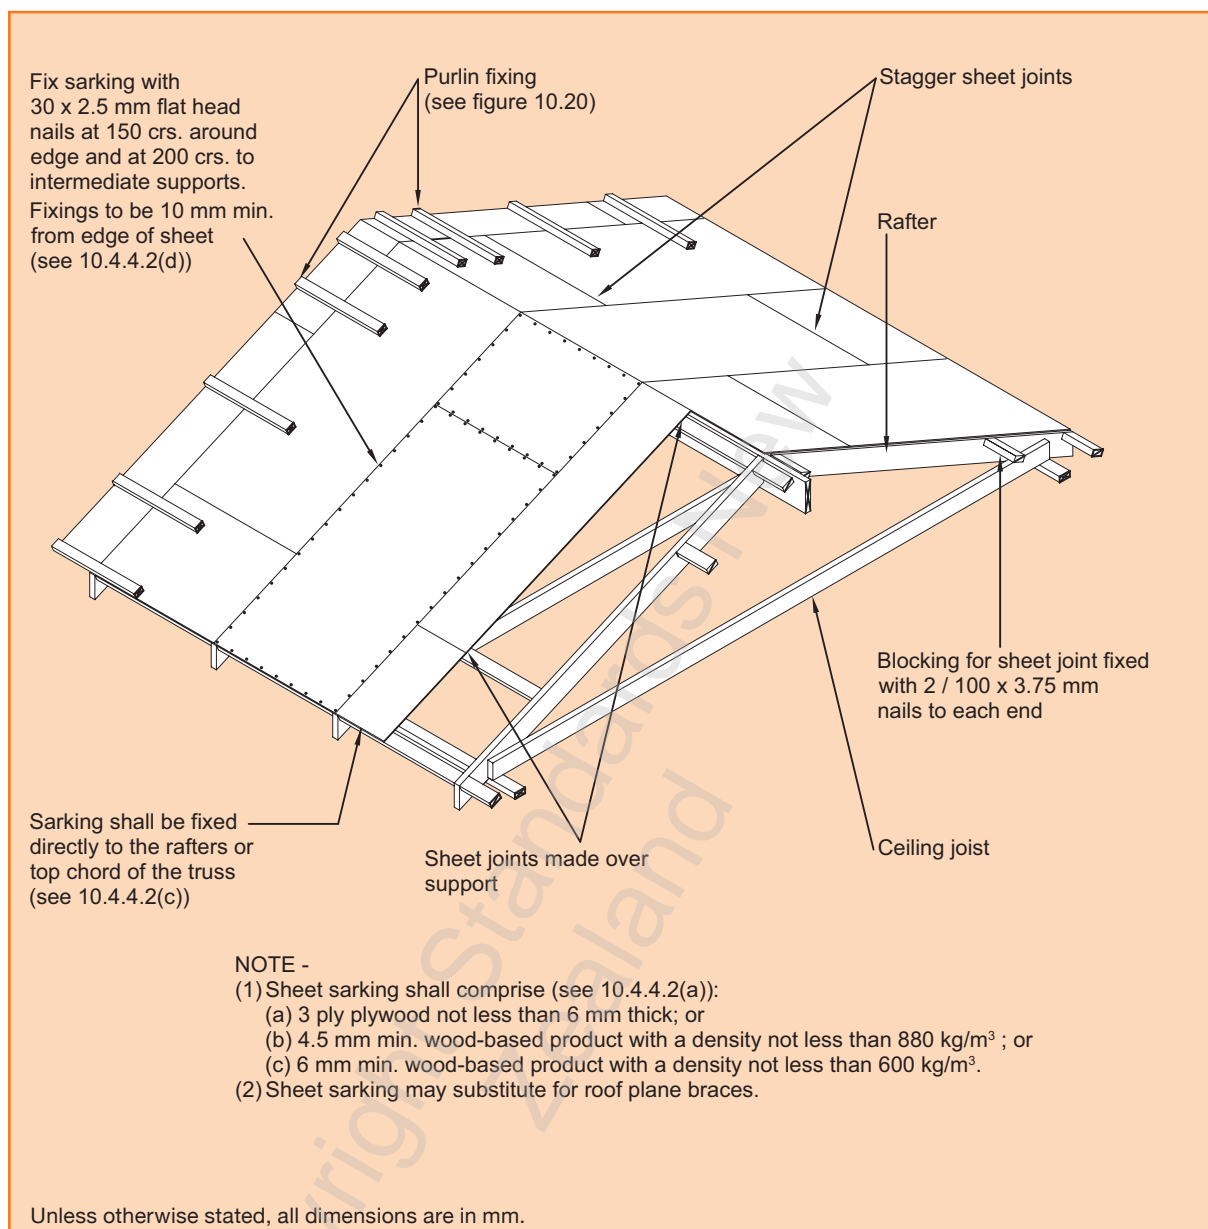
Sheet sarked roof (see 10.4.4.2(b))
